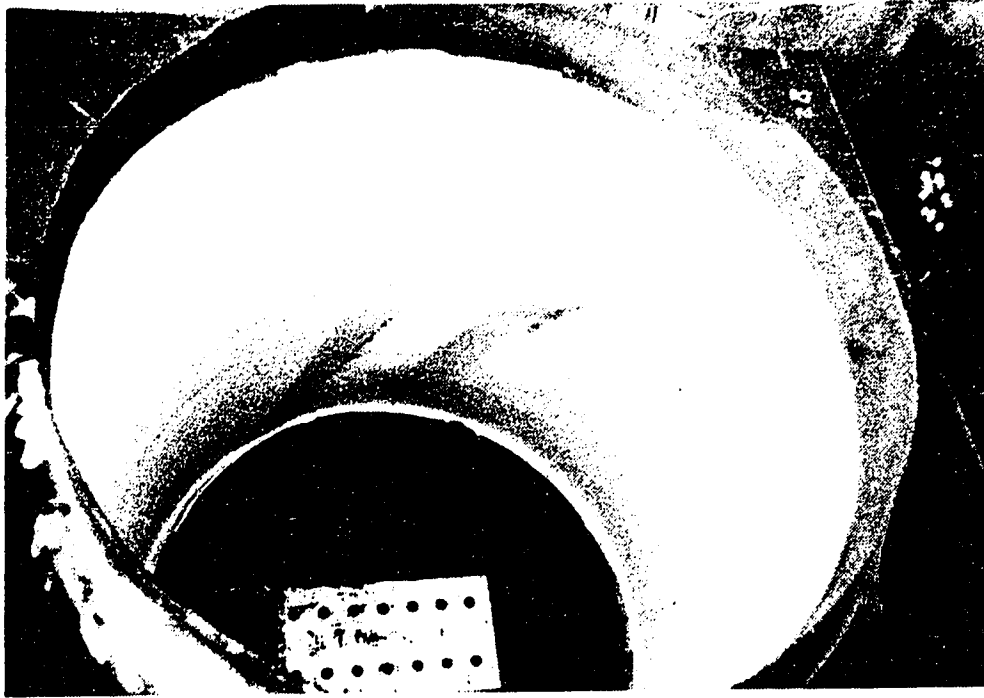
(b) Inside view of the buckled shape of Specimen S2
